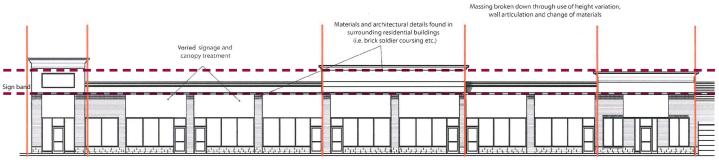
Typical residential retail block showing +/- 25% glazing based on facade area
